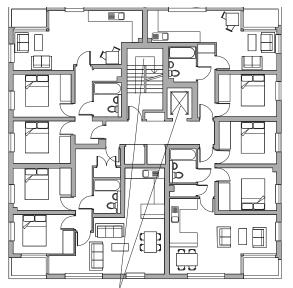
Floor plans lift and stairs for levels 1-3, Source: Trada terminate at 4th floor
